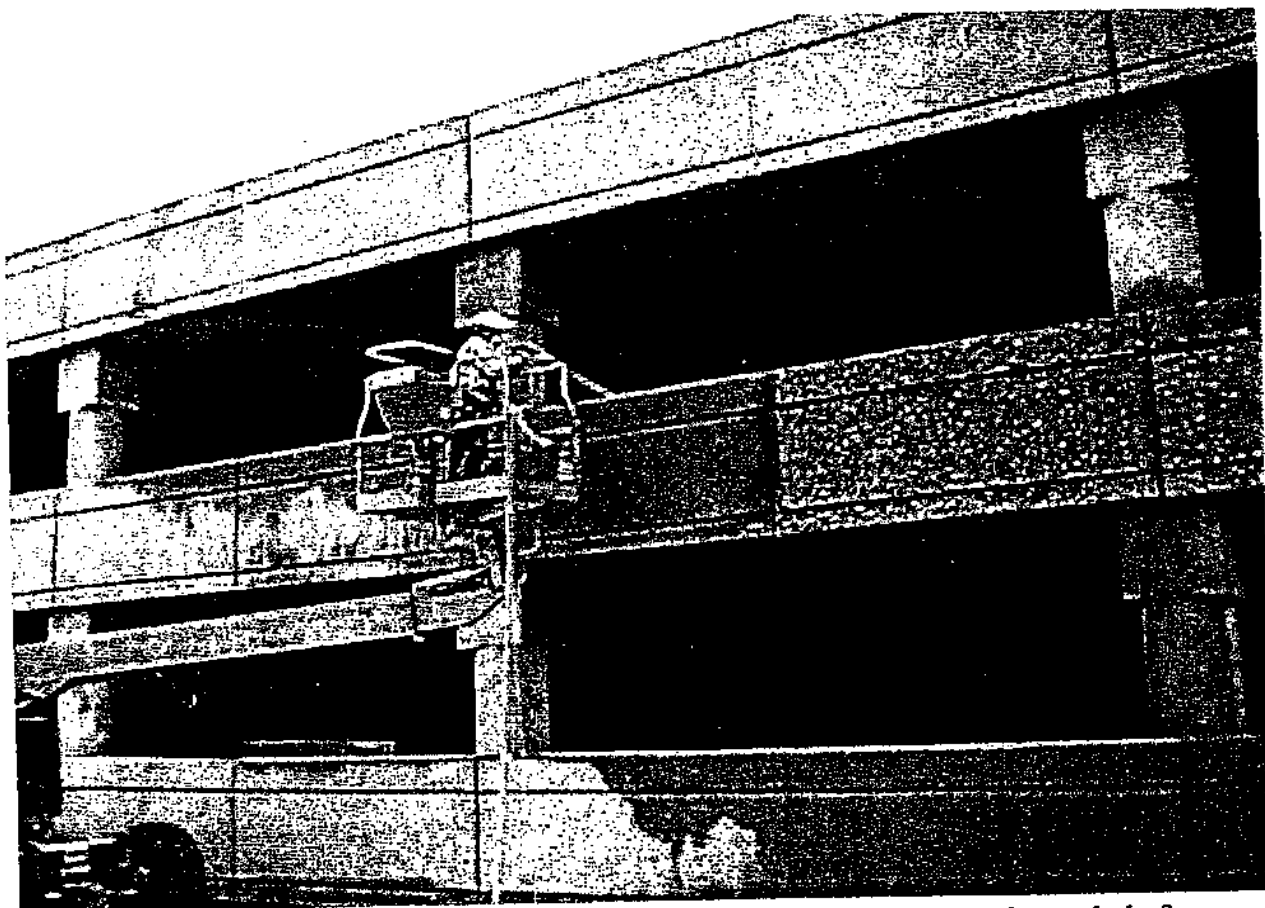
Worker performing abrasive blasting on a concrete wall from an elevated platform. The worker is removing about 1/8 to 1/4 inch of concrete in order to expose the aggregate.
